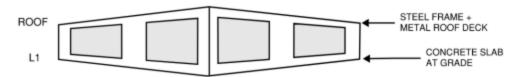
One Story Building for Horizontal Gravity System, courtesy SE 2050
